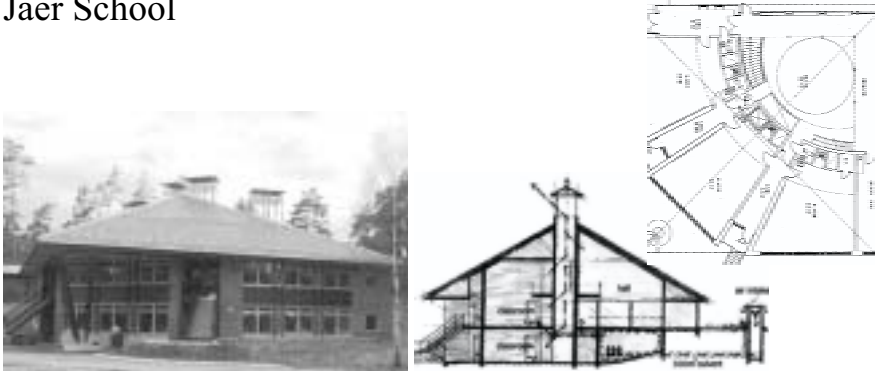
A large roof with several ventilation towers characterises the architectural expression of the Jaer School building (*left*). Drawing of the section (*middle*) and the plan (*top right*).
